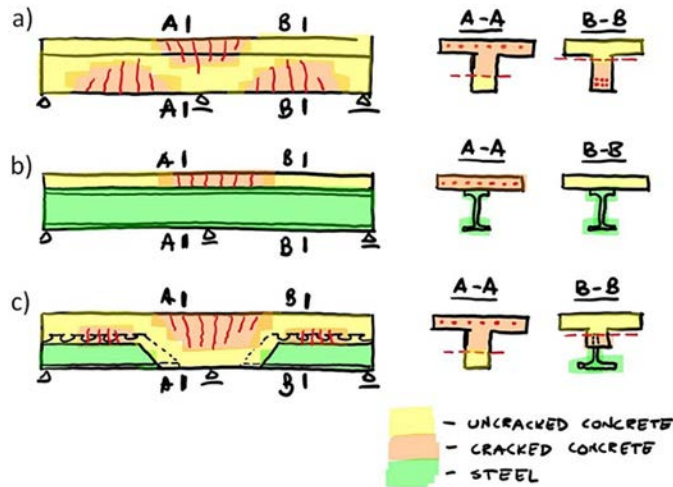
Concrete cracking ranges in (a) reinforced concrete beam, (b) composite beam, (c) hybrid beam [3]
